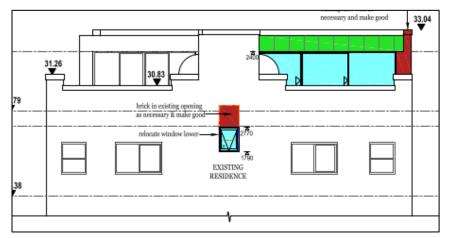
Southern elevation showing proposed addition will match the scale of the existing contemporary addition to this level. (Source: DBCF Pty Ltd, 2024)
